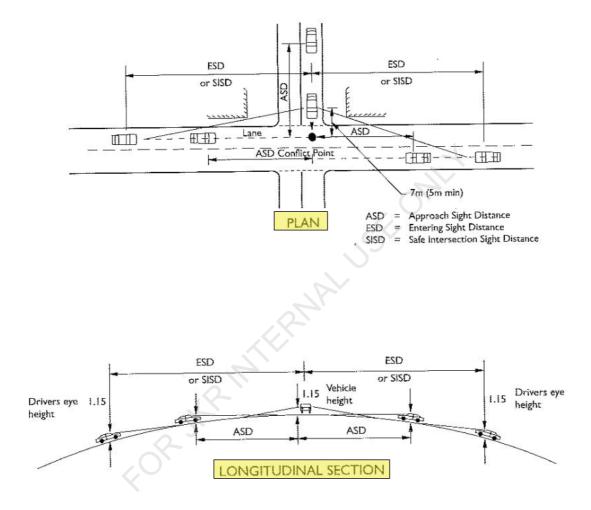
Typical Plan And Longitudinal Sections Showing Various Sight Distances At Intersection
